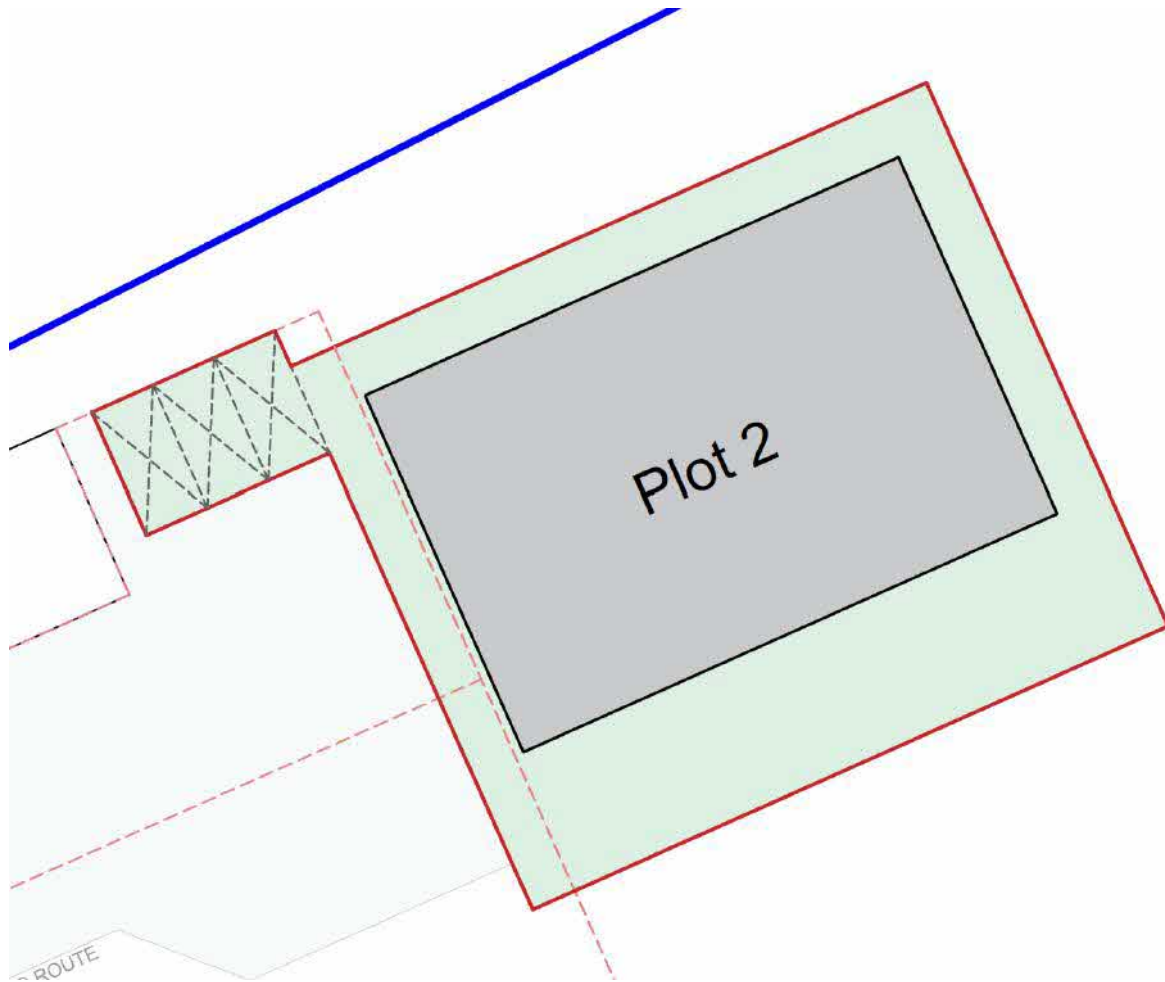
Proposed layout plan for Barn 2. Note that the barn to the west/southwest (also known as the Turkey Barn) will be partially demolished and replaced with soft landscaping, with a small area replaced by parking areas for the new plot.
